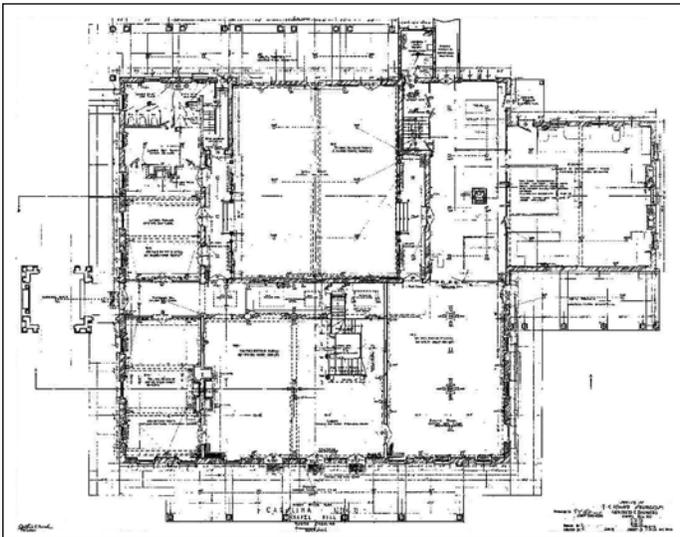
First-floor plan of the Carolina Inn (as designed), 1924, Arthur Nash, Architect (UNC Facilities Planning and Construction Plan Room).
